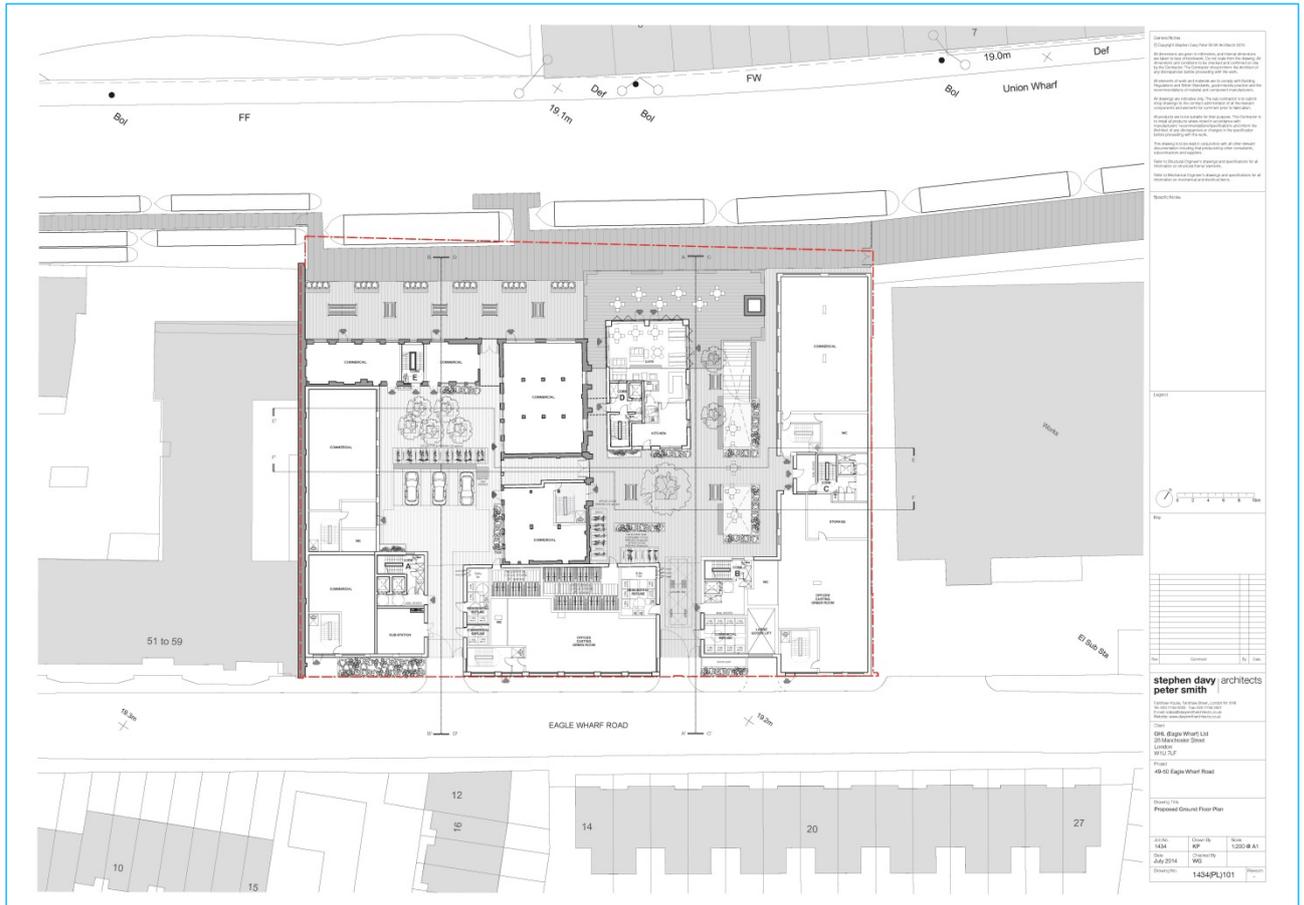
Proposed ground floor plan (Drawing 1434(PL)101, dated July 2014). For a larger plan see the pdf document submitted with planning application.
